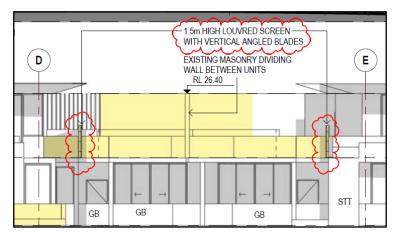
Revised Southern Elevation showing changes to the terraces (Source: Applicant's revised plans dated 19.2.19)
